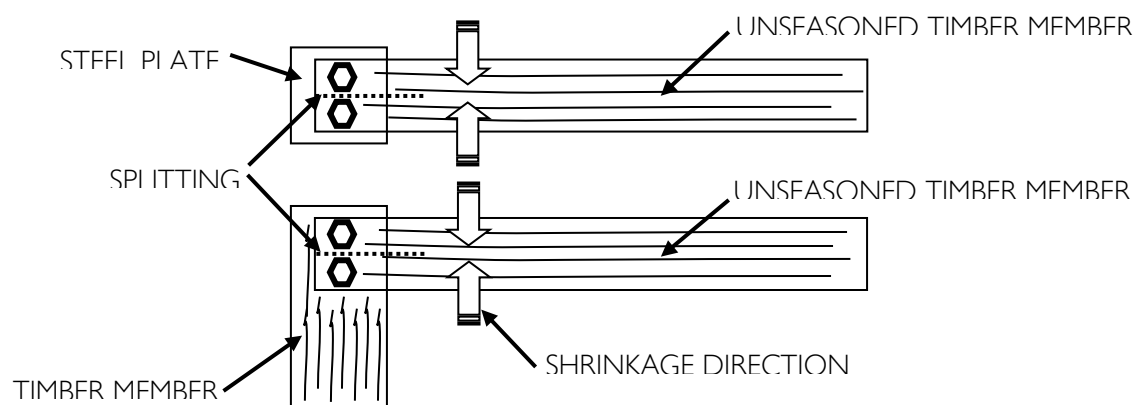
Poor Connection Detailing which Restrains Timber Shrinkage and Causes Splitting
